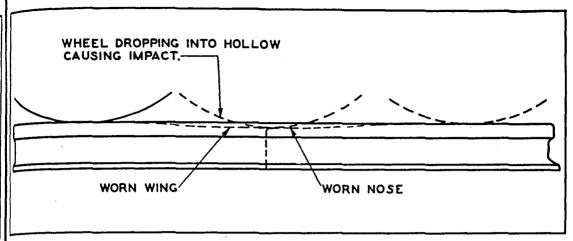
, WHEEL IMPACT ON WORN CROSSING.
